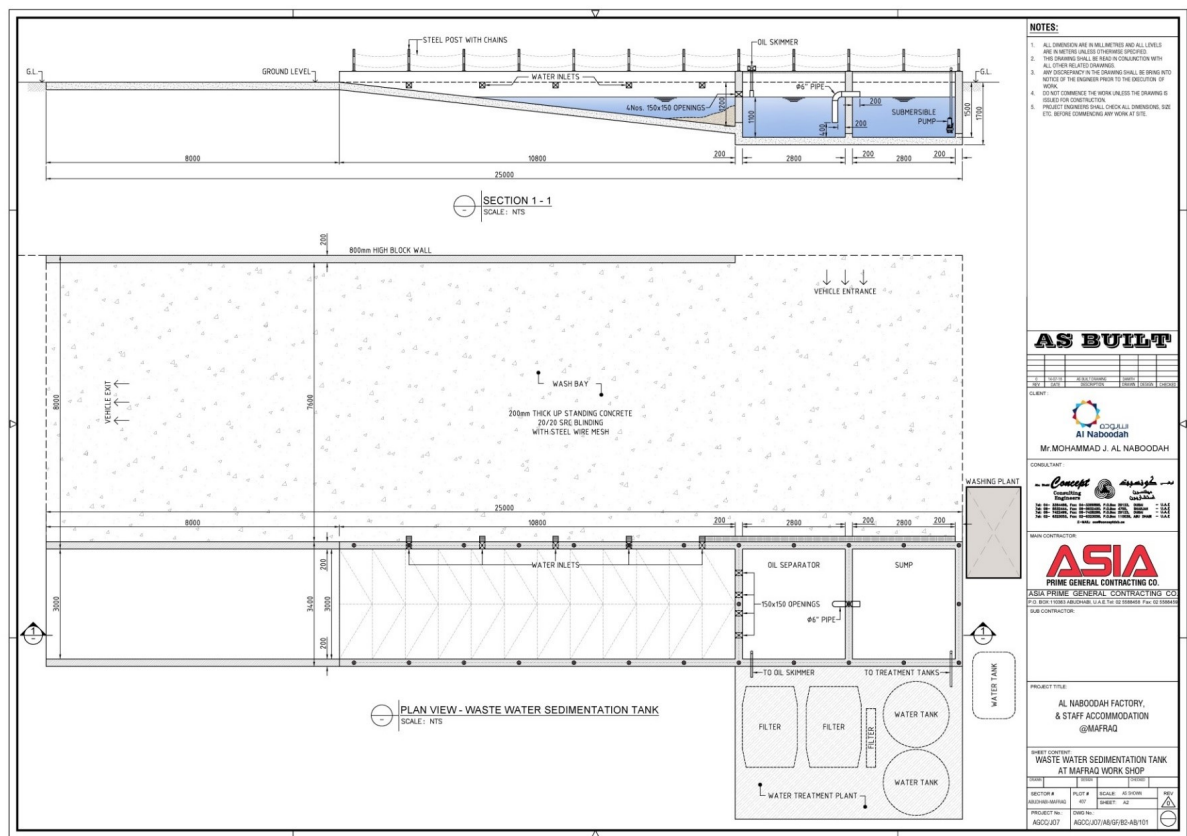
Wash bay, layout plan with details of waste water sedimentation tanks at NP workshop Abu Dhabi
